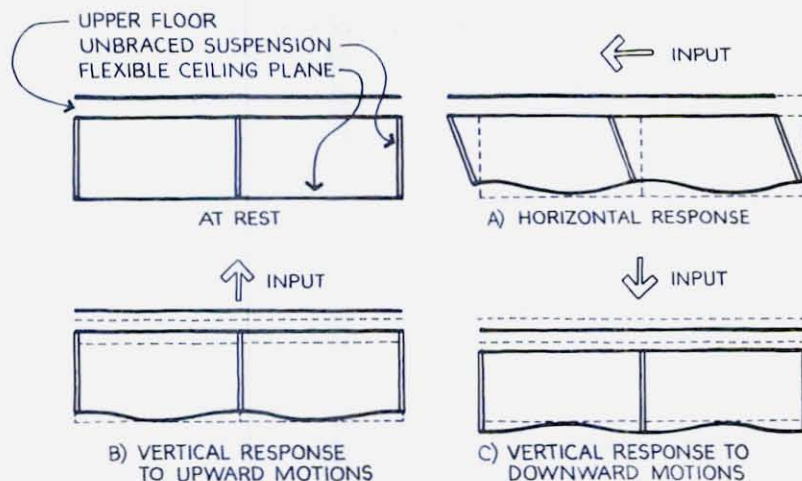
CEILING TYPE: FLEXIBLE CEILING PLANE - UNBRACED SUSPENSION.
